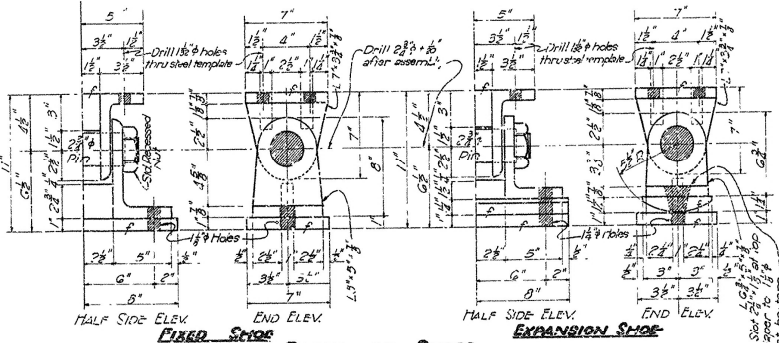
DETAILS OF LOWER FLANGE OF BEAM AT ENDS OF SPAN
